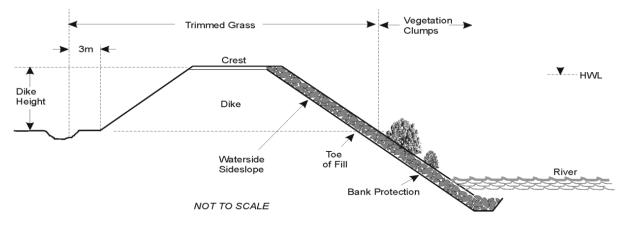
Typical Cross-Section of Riprap Protection for Riverside of the Dikes
